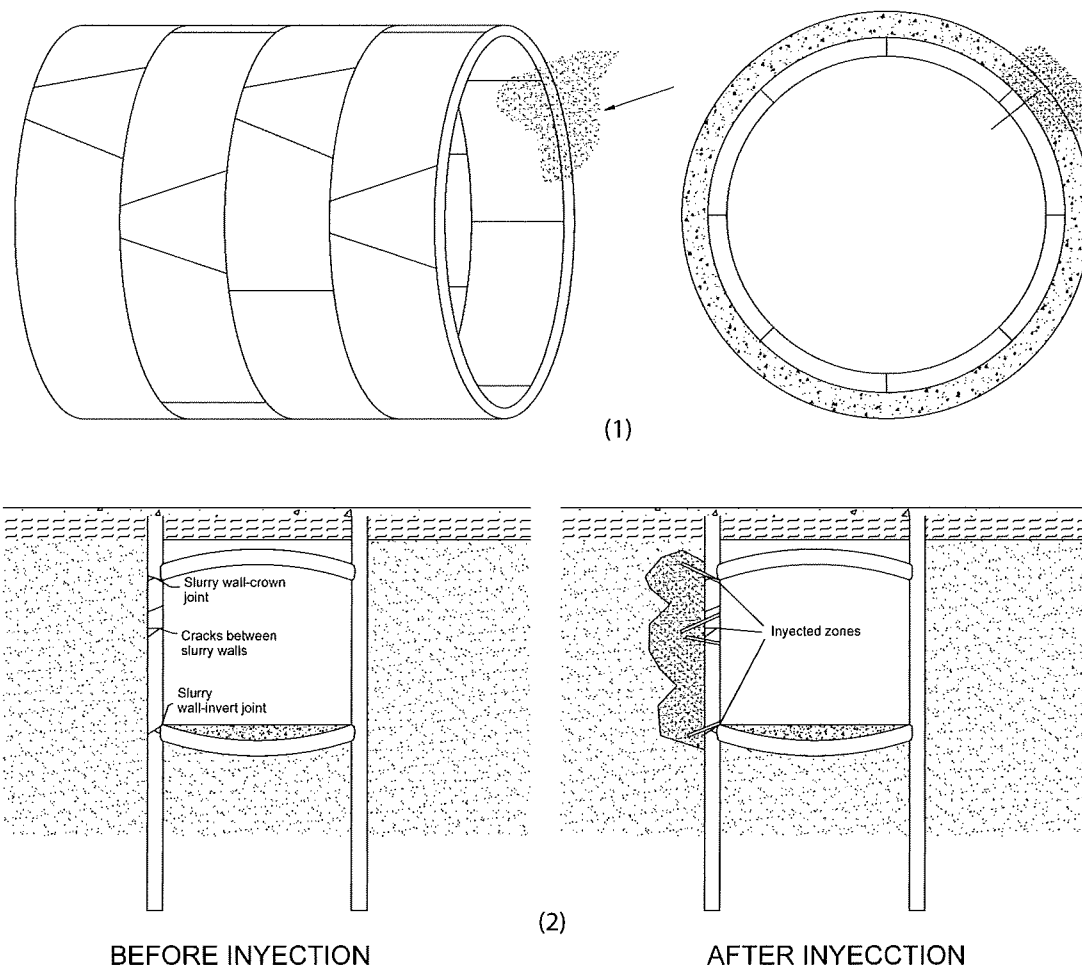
Cross-sections showing injected waterproofing in tunnels with segment ring lining (1) and built between slurry walls (2).
